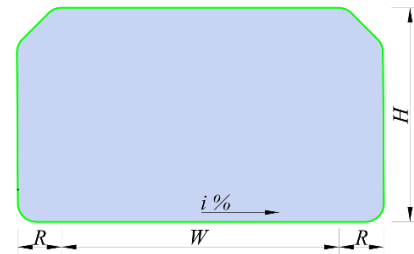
Typical two-lane tunnel cross section. Note: R is the curb or sidewalk; i is slope.
